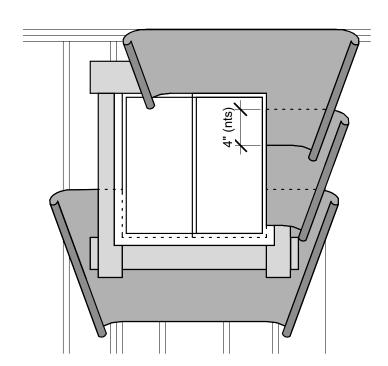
attach flexible flashing sill strip with top edge level with rough sill, extend beyond edge of rough opening at least 8", secure all moistop (or eq) with galvanized nails or power-driven staples.
